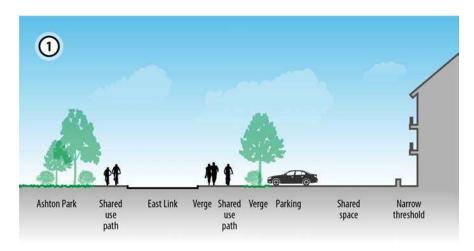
Indicative Street Section 1: East Link facing Ashton Burn Park.
